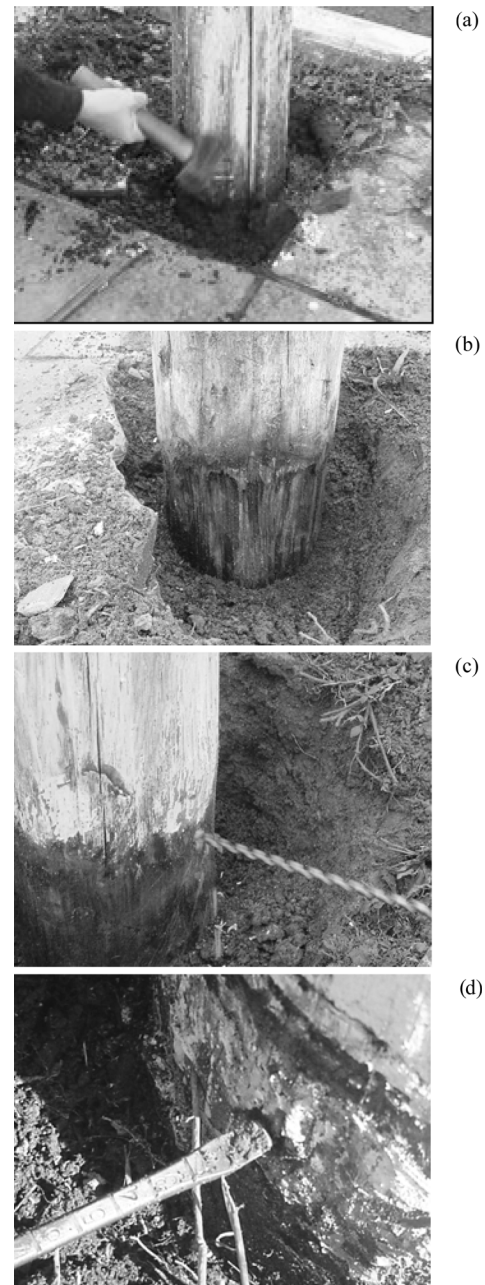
Steps for external (a)–(b) and internal (c)–(d) inspection of the in service poles. (a) Hammer test. (b) Digging and external inspection. (c) Drilling a hole to internal inspection. (d) A marked metal rod used to assess solid wood thickness.
